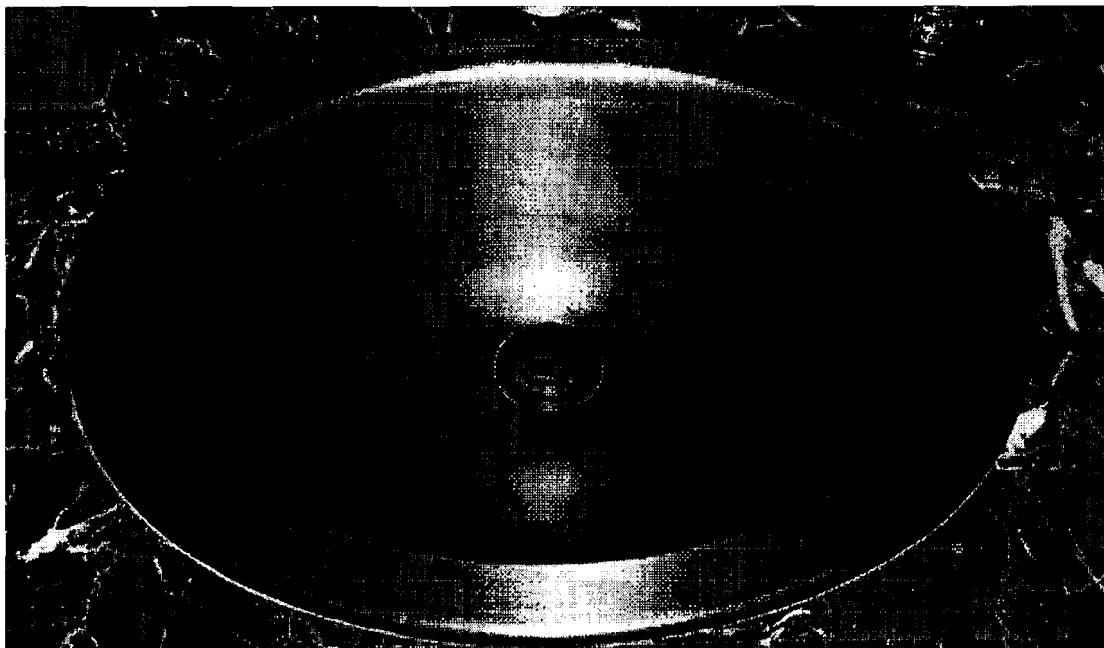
Photograph of pitting on sink in the first floor guest bedroom.
